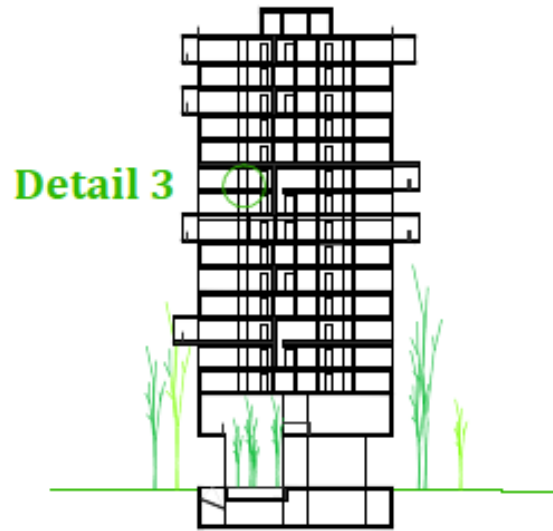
Detail for the floor-ceiling-wall solution with exposed CLT panels.
